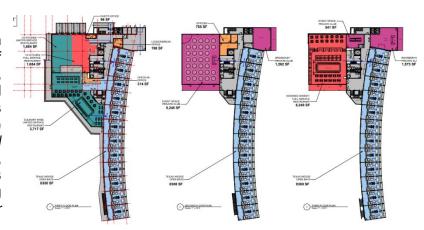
CONCEPT FLOOR PLAN FOR THE FACILITY
